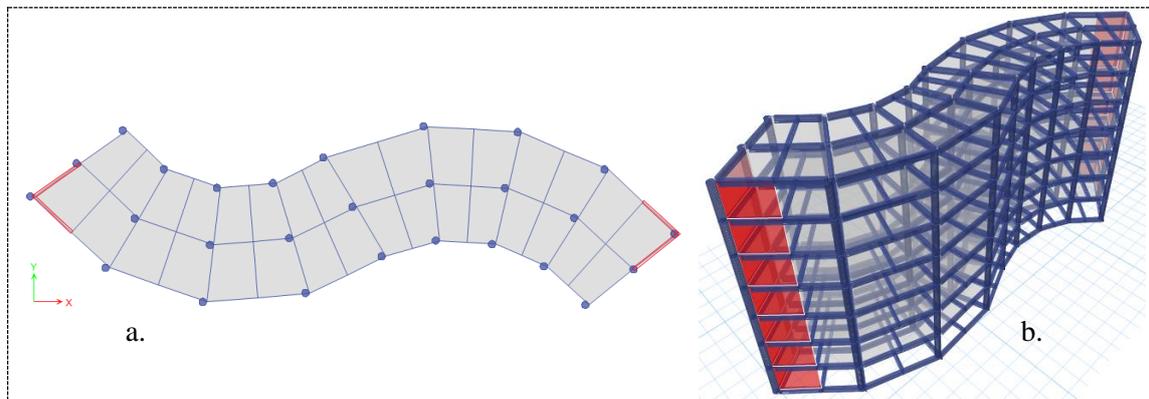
Model 3A (after shear walls were installed): a) the plan, b) 3D.
